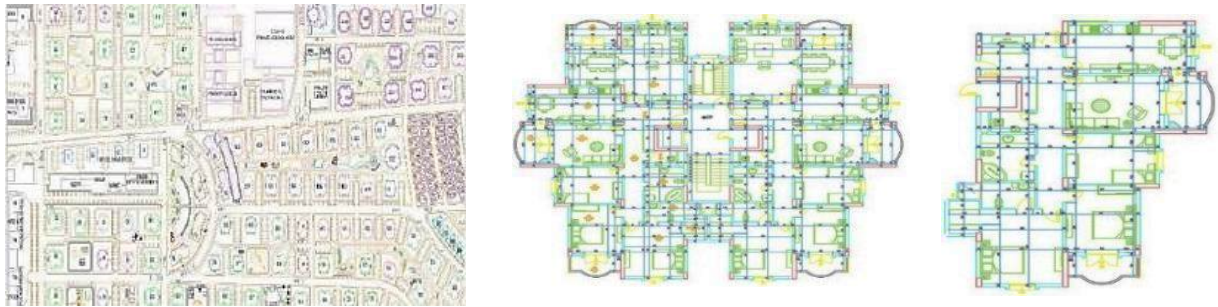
Avro City Site Plan, Apartment Floor Plan, and Three-Bedroom Floor Plan
